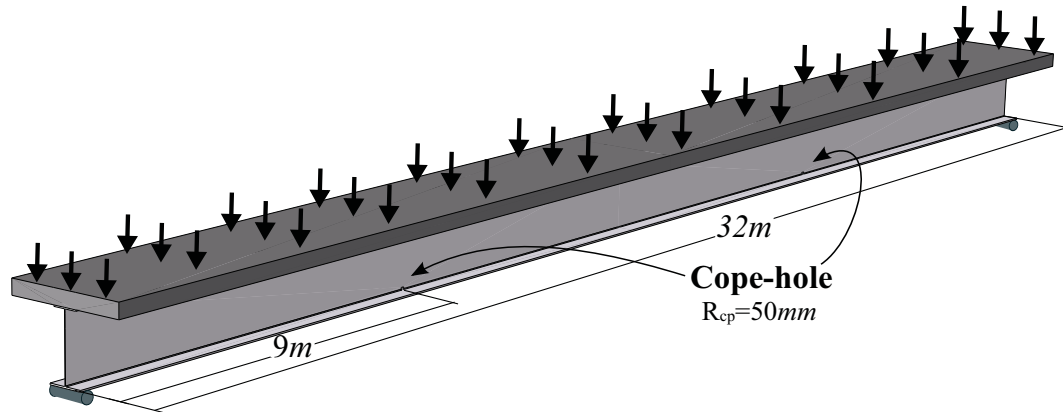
Composit steel-concrete bridge with cope-holes
